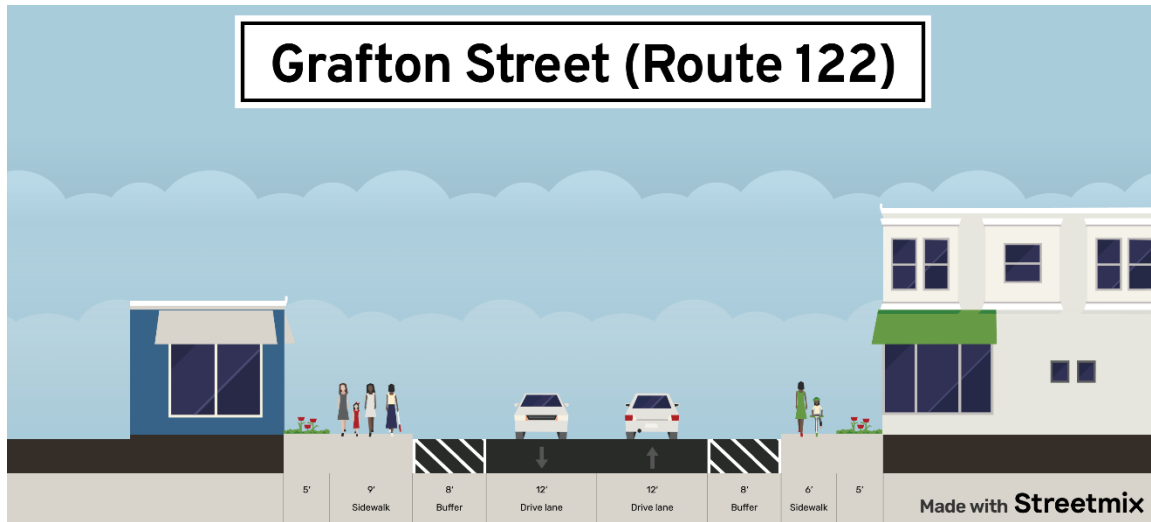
Grafton Street (Route 122) Typical Section Existing Conditions
